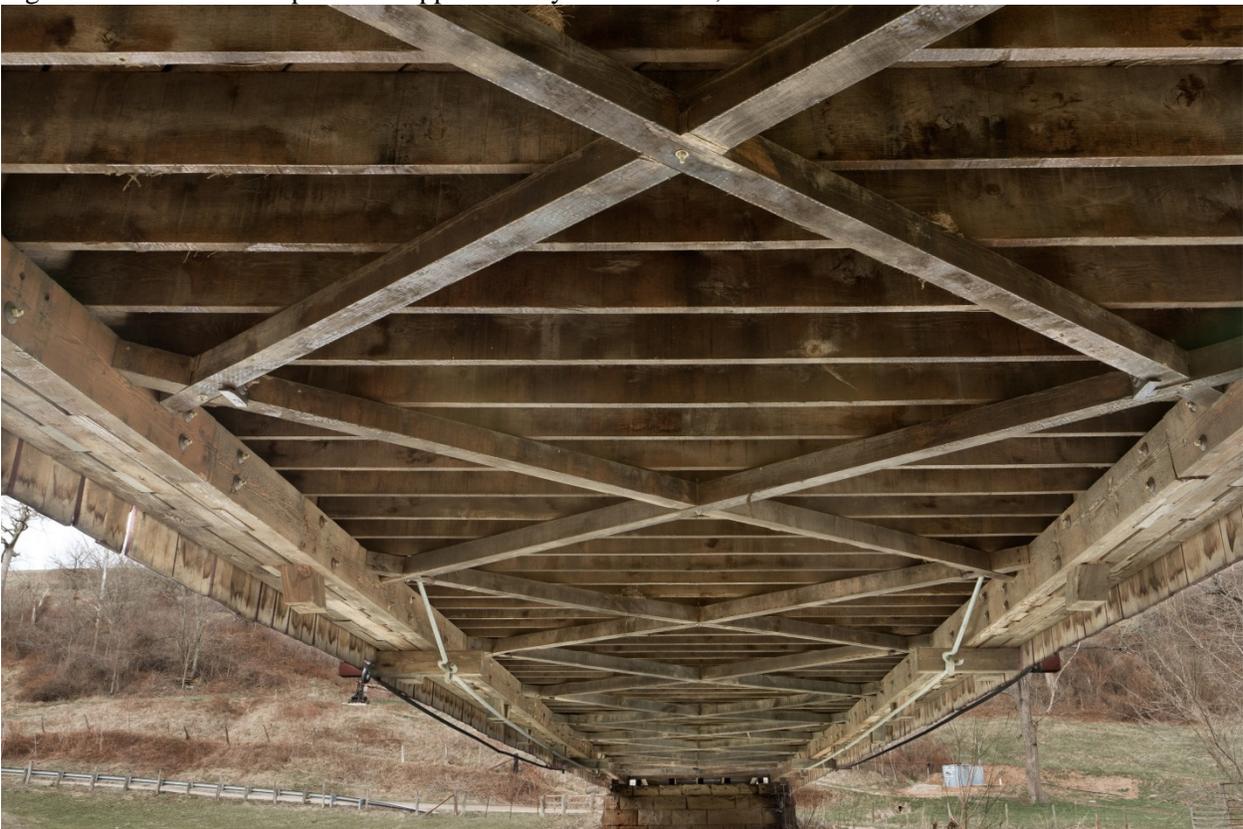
Lower lateral bracing in Smith's X-bracing pattern. Note bolt and casting connections at edge of lower chords. View to east.
